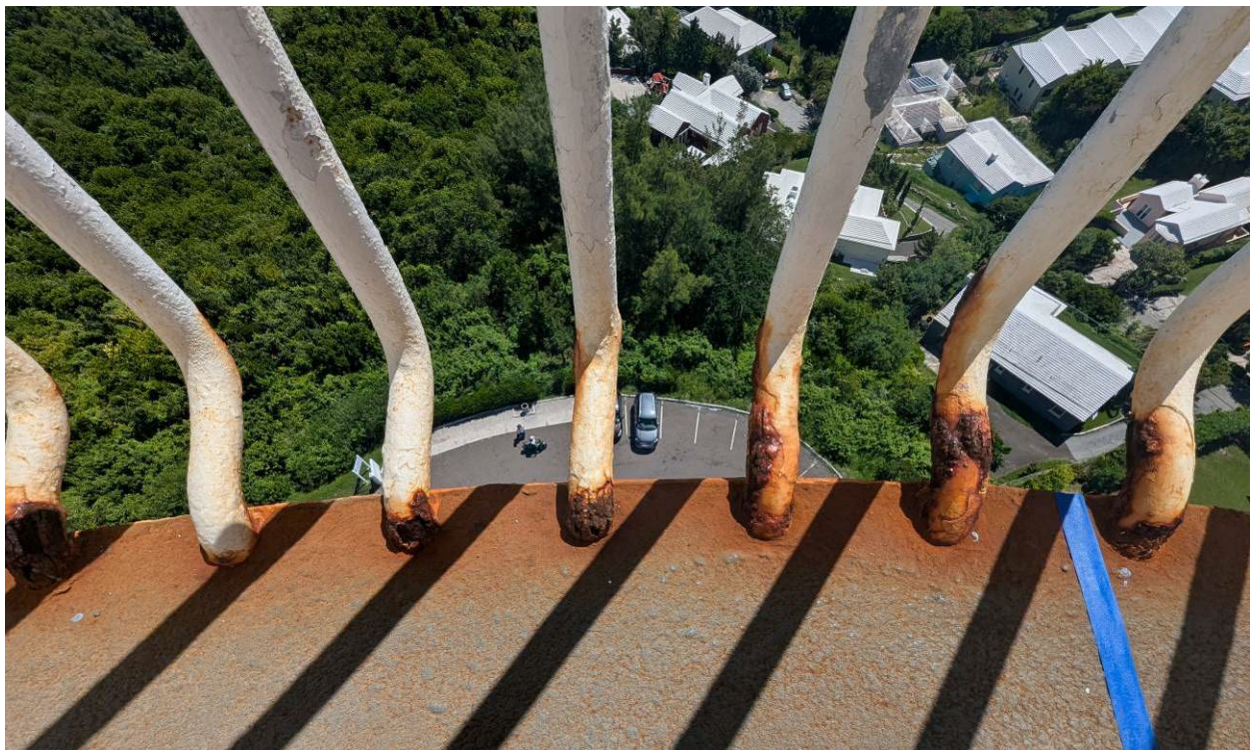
Lower railings connection to platform in Section 6 (Bars 101-108)
